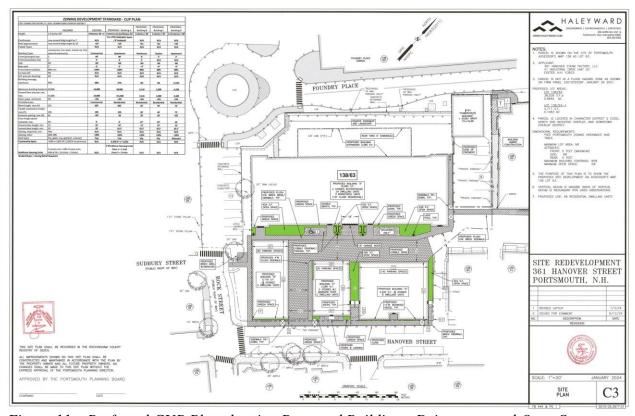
Preferred CUP Plan showing Proposed Buildings, Driveways, and Open Space
